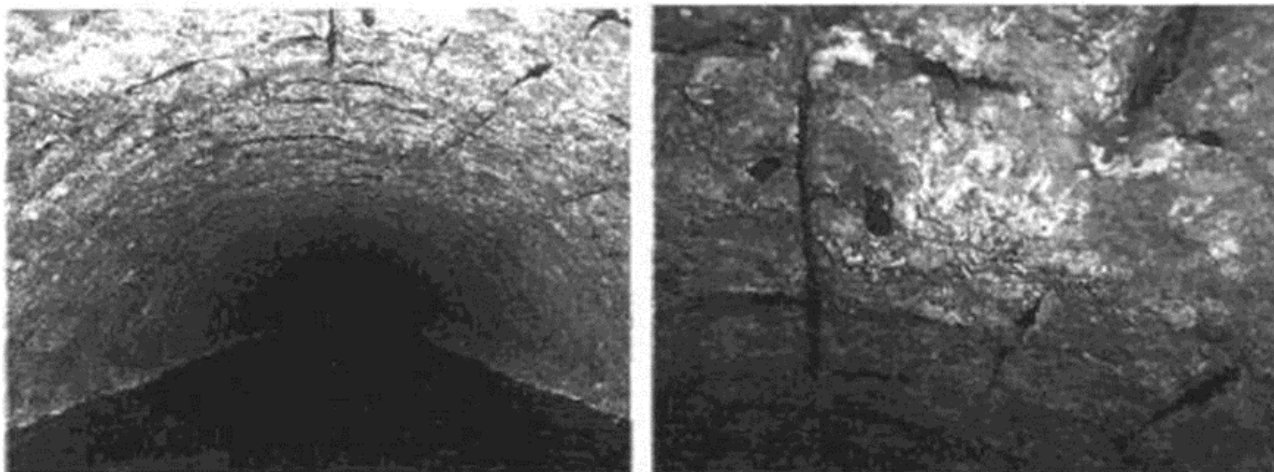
Corrosion of reinforced concrete and steel reinforcement in a sewer tunnel in Kharkiv
